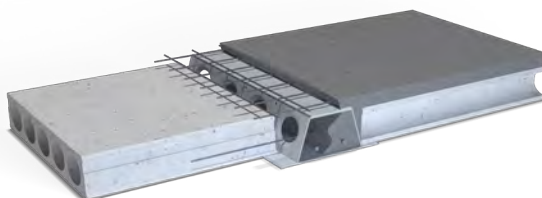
Slim floor example with precast slabs supported on bottom steel flange of DELTA BEAM®, courtesy of ©Peikko Group Corporation.
